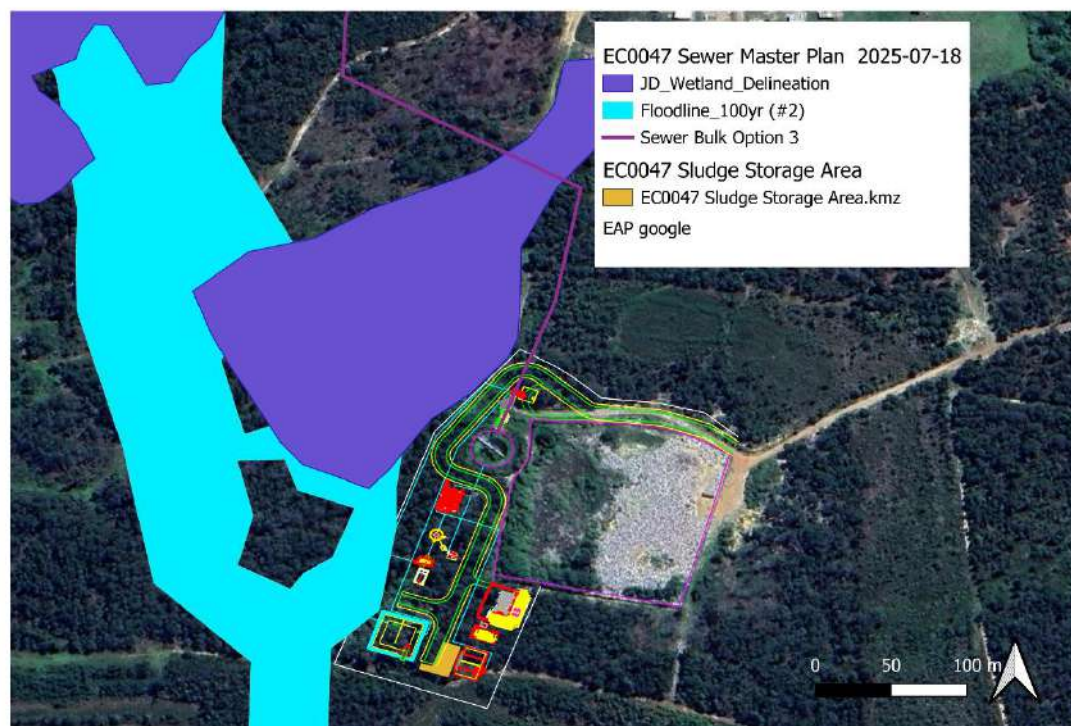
Site layout 3 – structures outside wetland, bulk pipeline 3, sludge storage area
